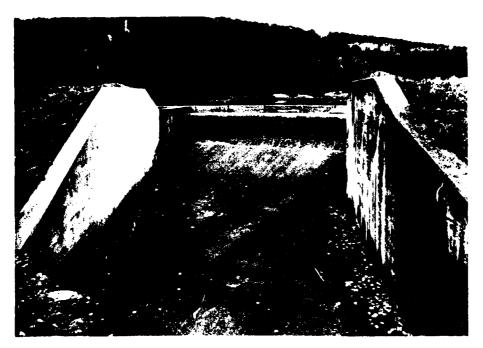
View of the downstream side of the spillway weir crest.
